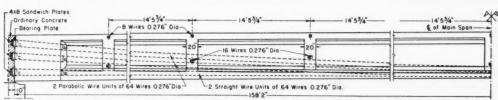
Half Longitudinal cross section of a typical Magnel prestressed concrete girder showing parabolic path to cables.
